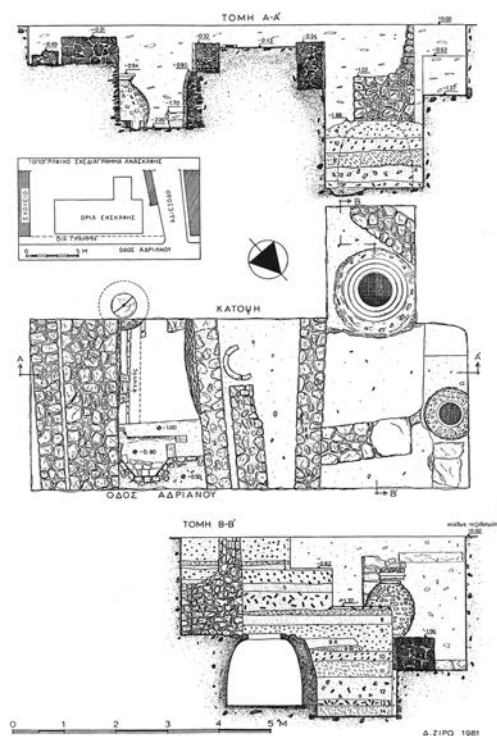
Remains of Byzantine buildings in the 104 Adrianou Street plot. Plan, two sections and block plan. Drawing by D. Giraud.
